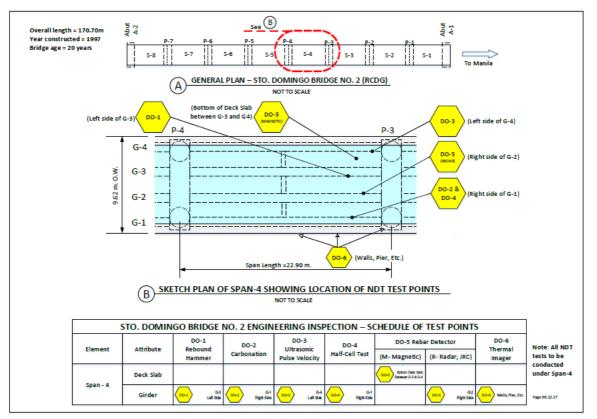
Test Point Location Plan (Luzon Area)
